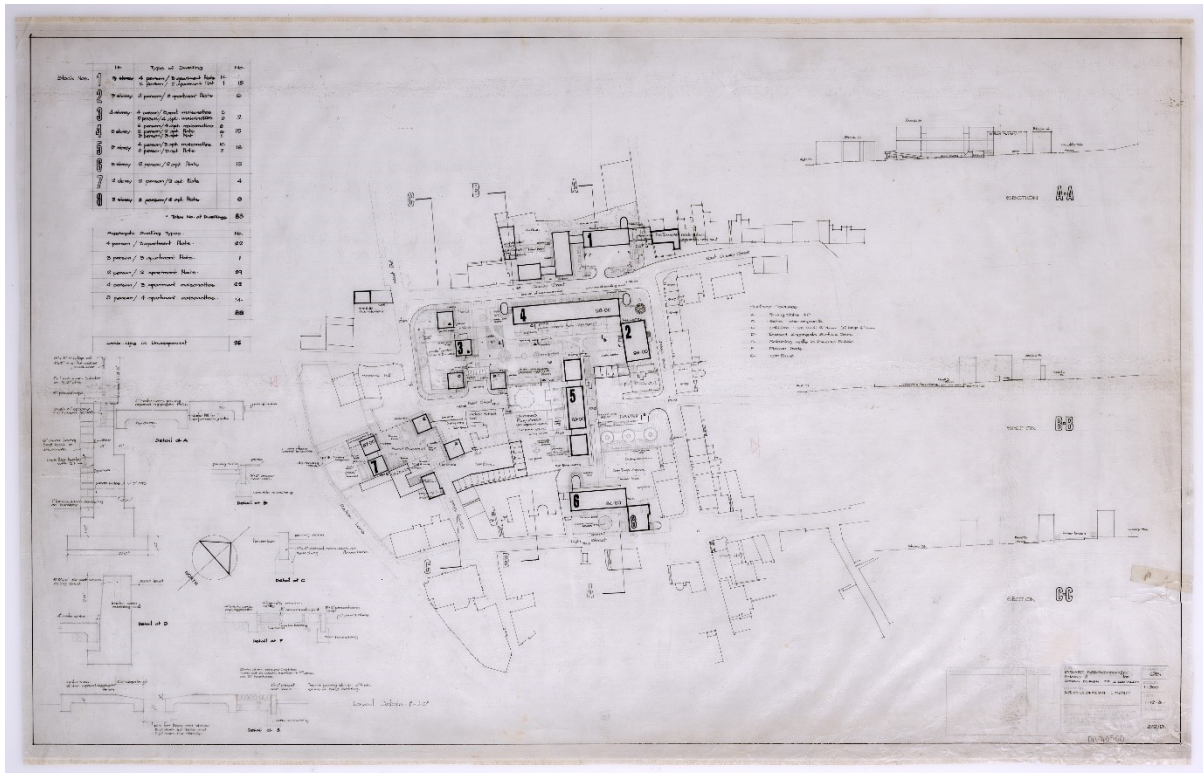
Final layout plan for the Phase 2 Area, 1st of December 1961.
